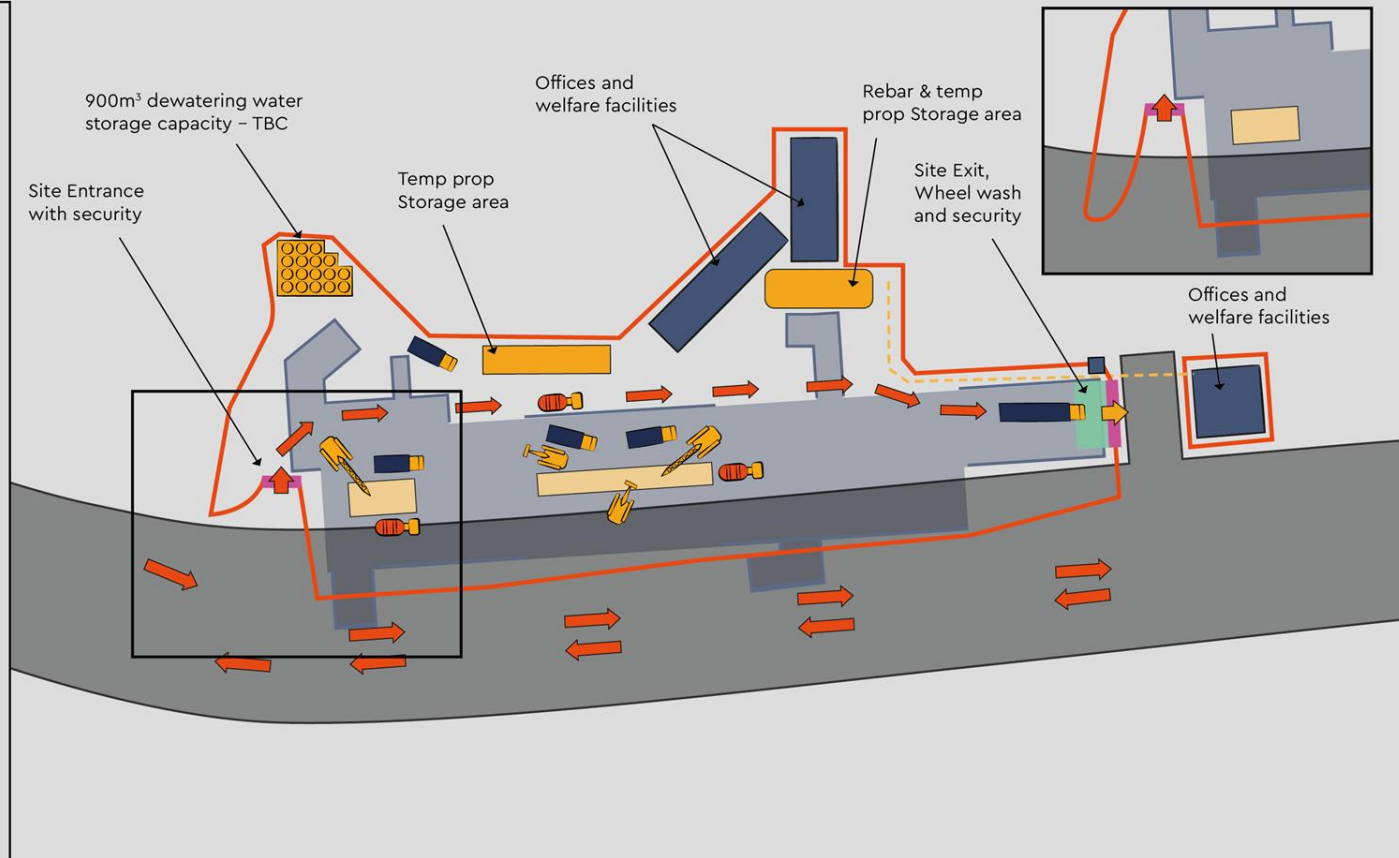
Collins Avenue Stage 4 - Roof Slab Construction
